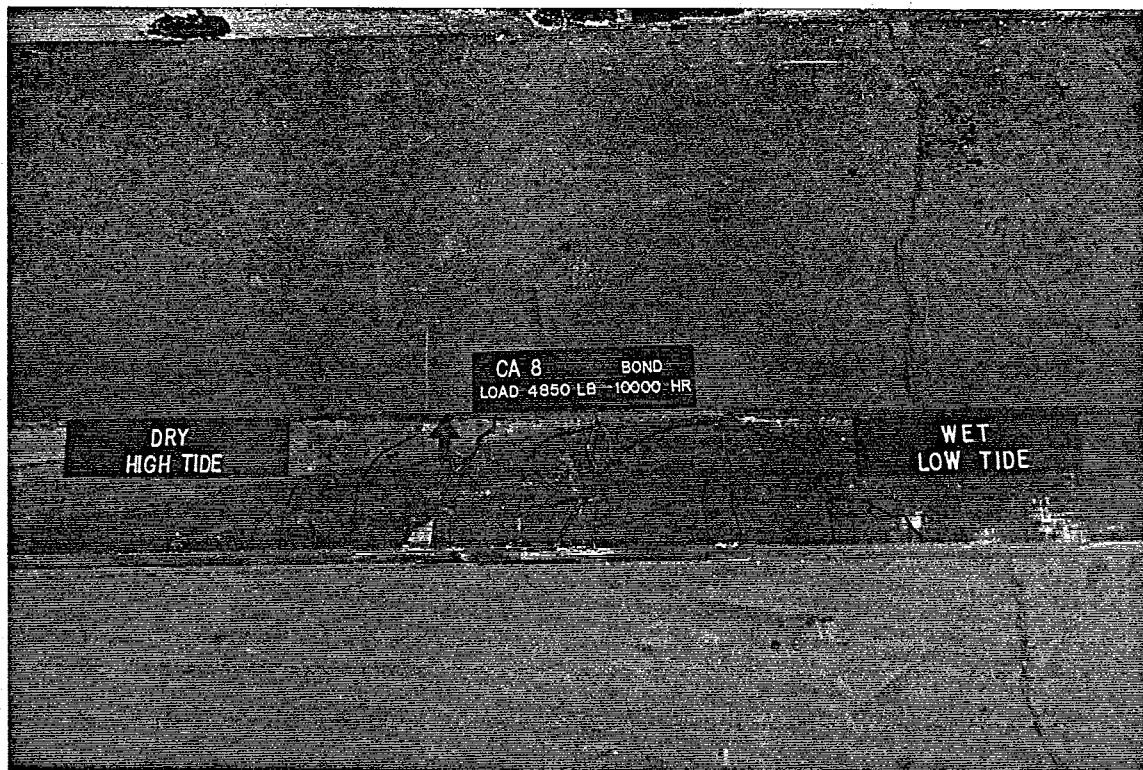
Crack Pattern for Beam CA 8 - Tested After 10,000 Hours
